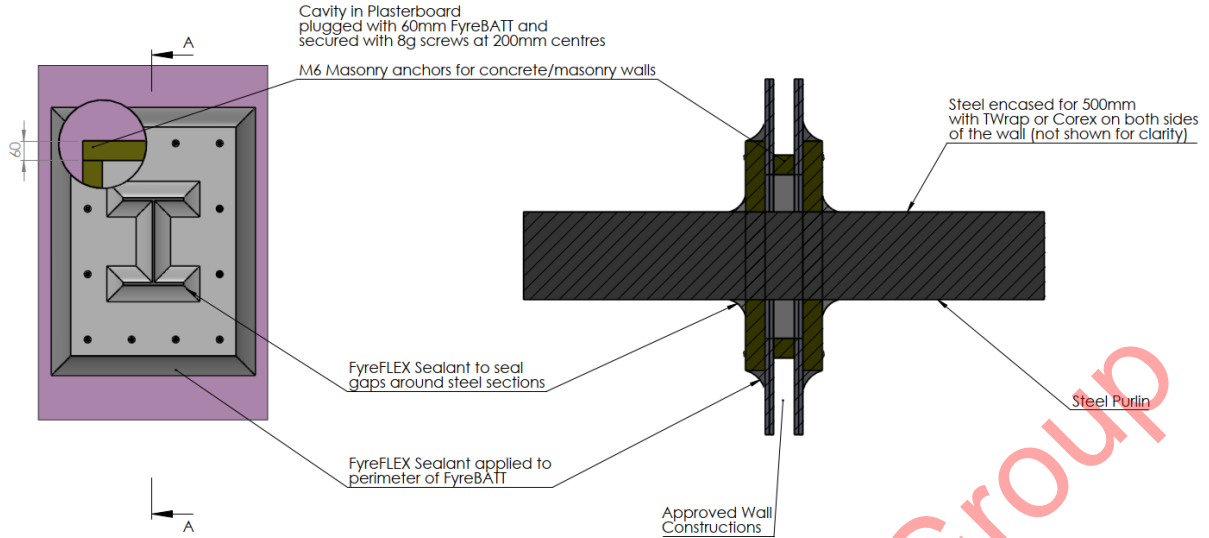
Proposed steel beam/purlin penetration system – detail 8
